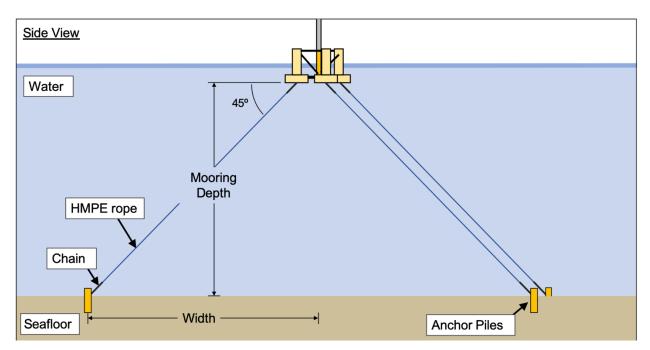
Side view of platforms with taut-leg mooring and anchor piles. Drawing not to scale.
